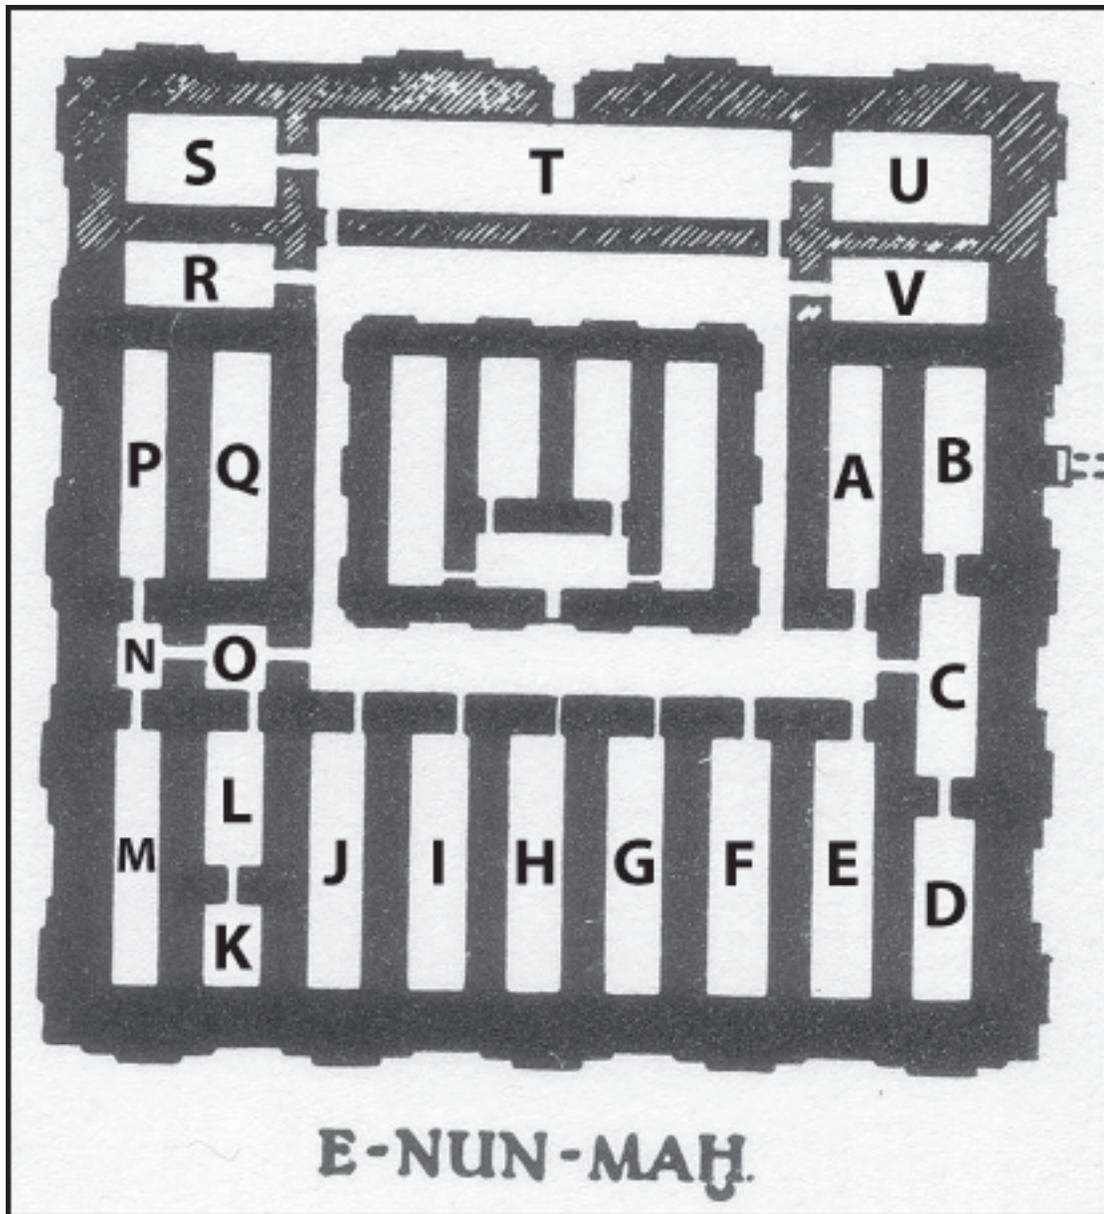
Ur. Plan showing the Enunmakh (including Woolley's conjectural reconstruction of the northwestern part of the building and my own room labels). (After Woolley 1974: Pl. 53)
